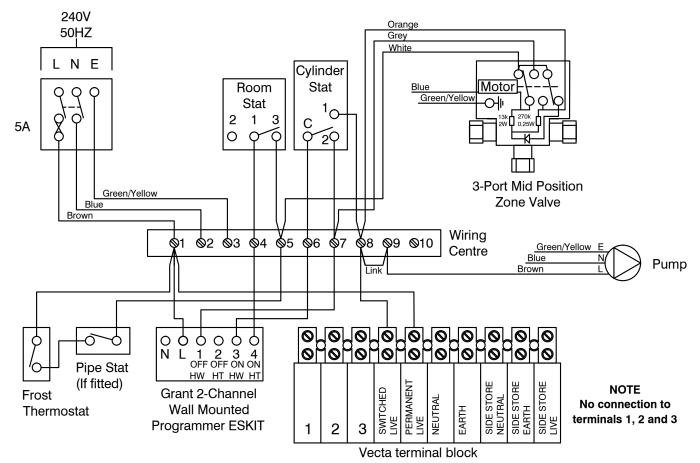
Heating system controls - Y-plan type system connection diagram
